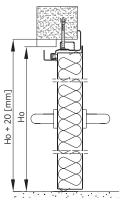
Installation of a double-leaf door with a corner frame to a masonry wall – vertical cross-section
